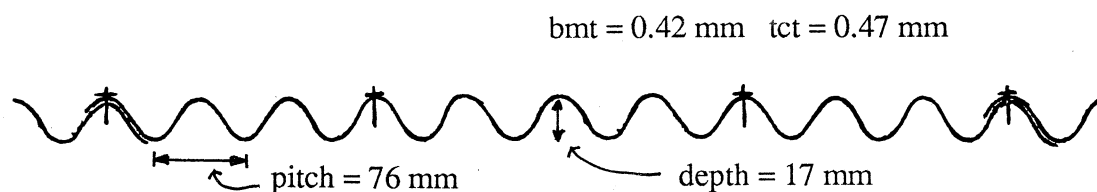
Corrugated Roofing Crest-fastened with Three Fasteners per Sheet
